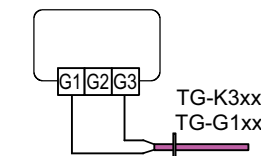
Wiring of floor or duct sensor when using internal setpoint
